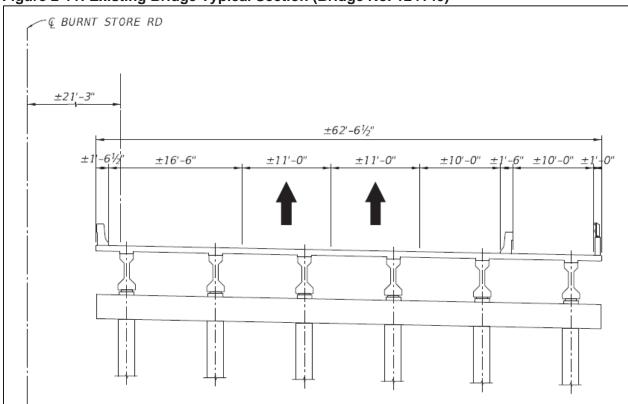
Existing Bridge Typical Section (Bridge No. 124140)
